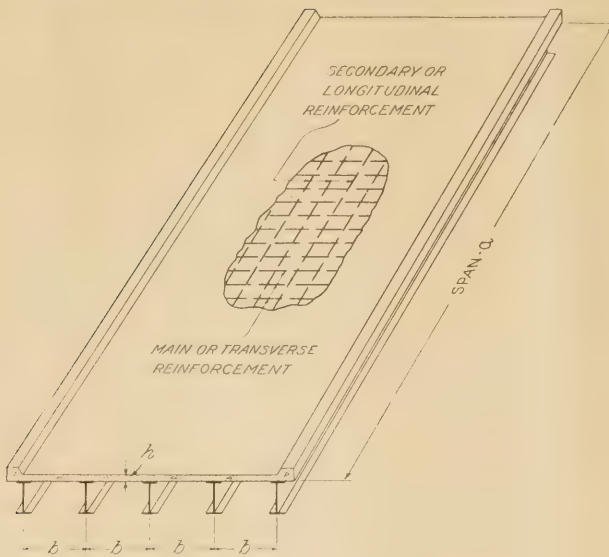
TYPICAL I-BEAM BRIDGE.
